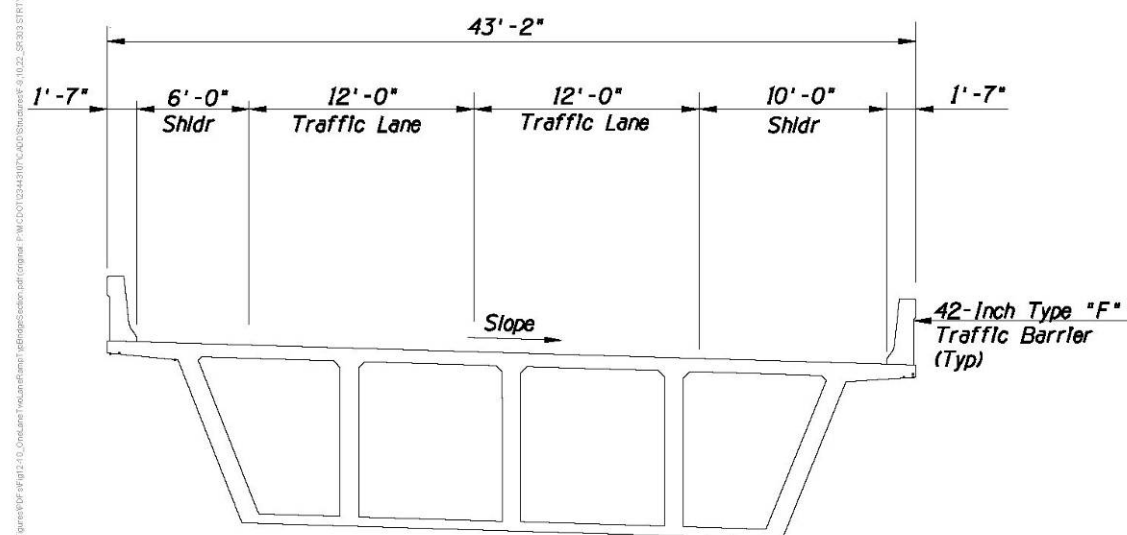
Frontage Road Bridges and I-10 Bridges Over SR 303L and Frontage Roads
